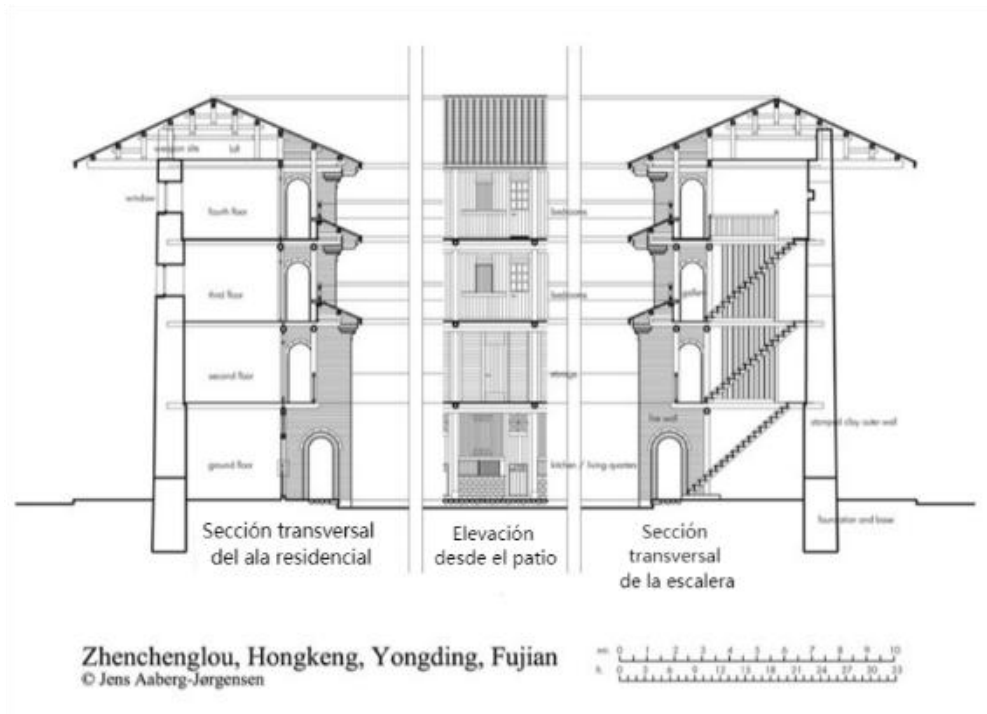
Cross Section of a Typical *Tulou* /Sección transversal de un *Tulou* típico
